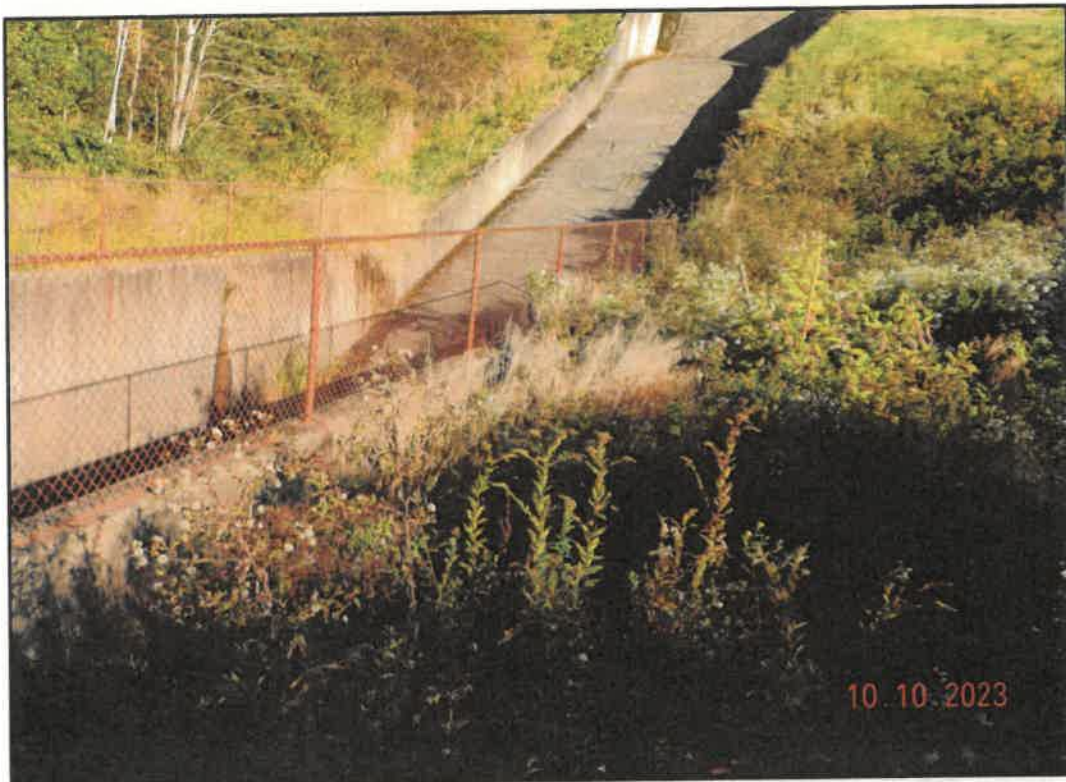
View of Wet Area behind Eastern Abutment Wall at Stilling Basin
